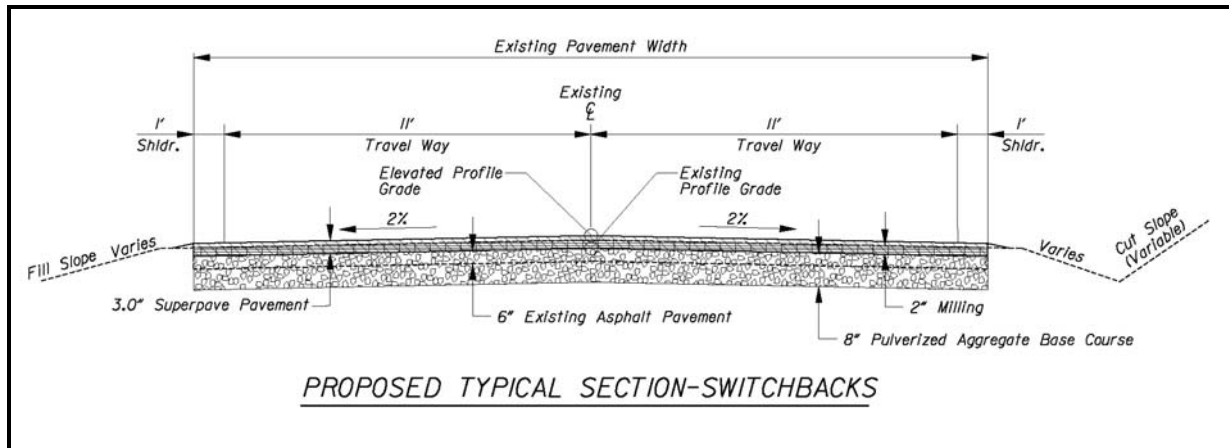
PROPOSED TYPICAL SECTION—SWITCHBACKS
